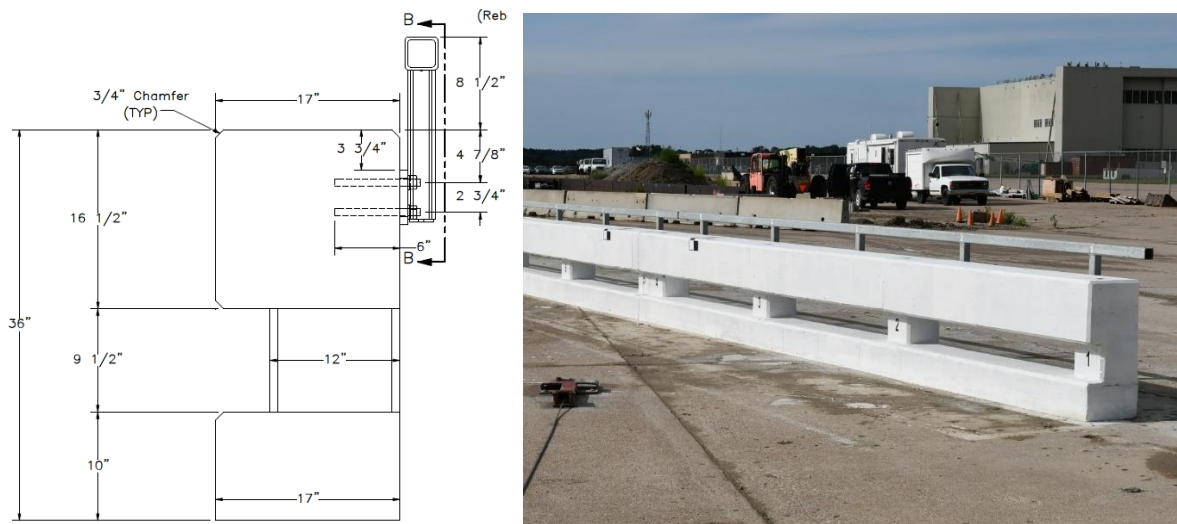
Hawaii Concrete Post and Beam Bridge Railing
